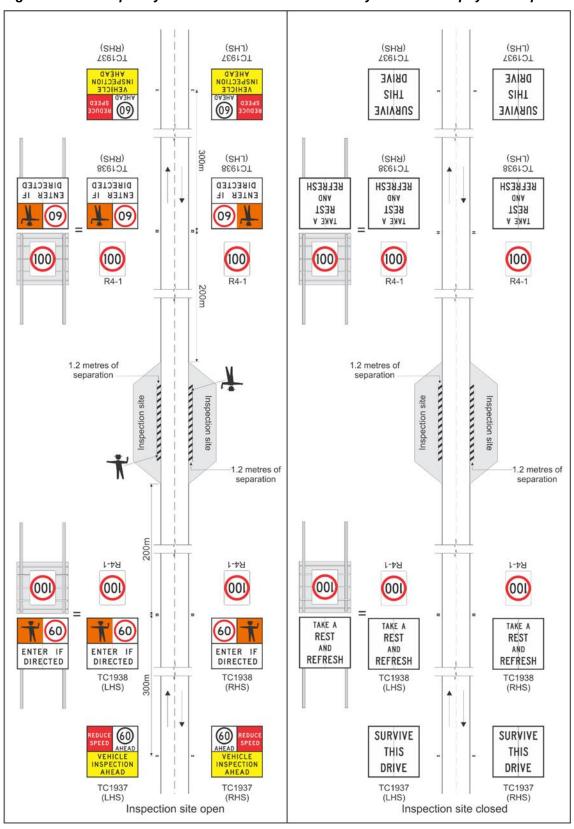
Example layout for two-sided site on two-way road with no physical separation
